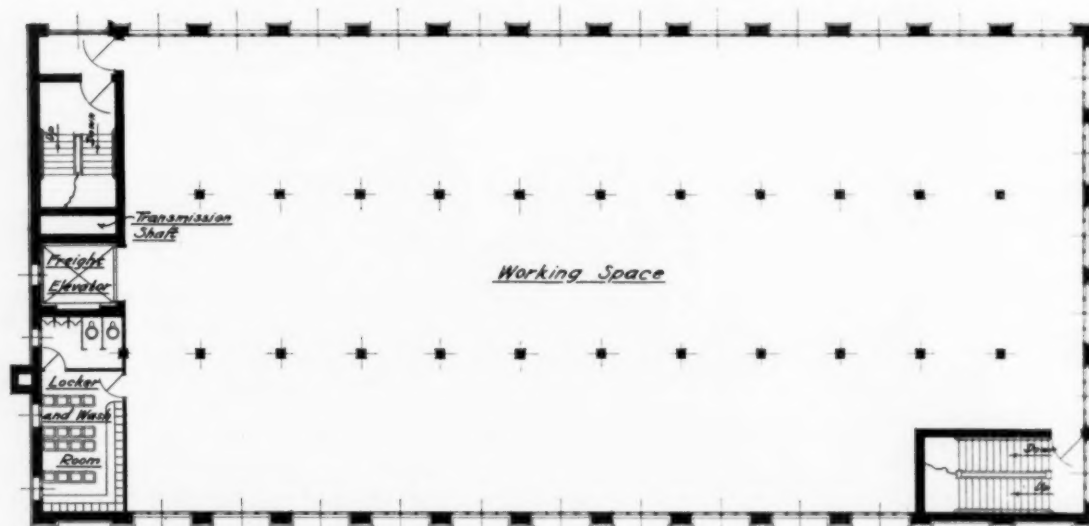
FACTORY BUILDING MILL CONSTRUCTION. TYPICAL FLOOR PLAN
